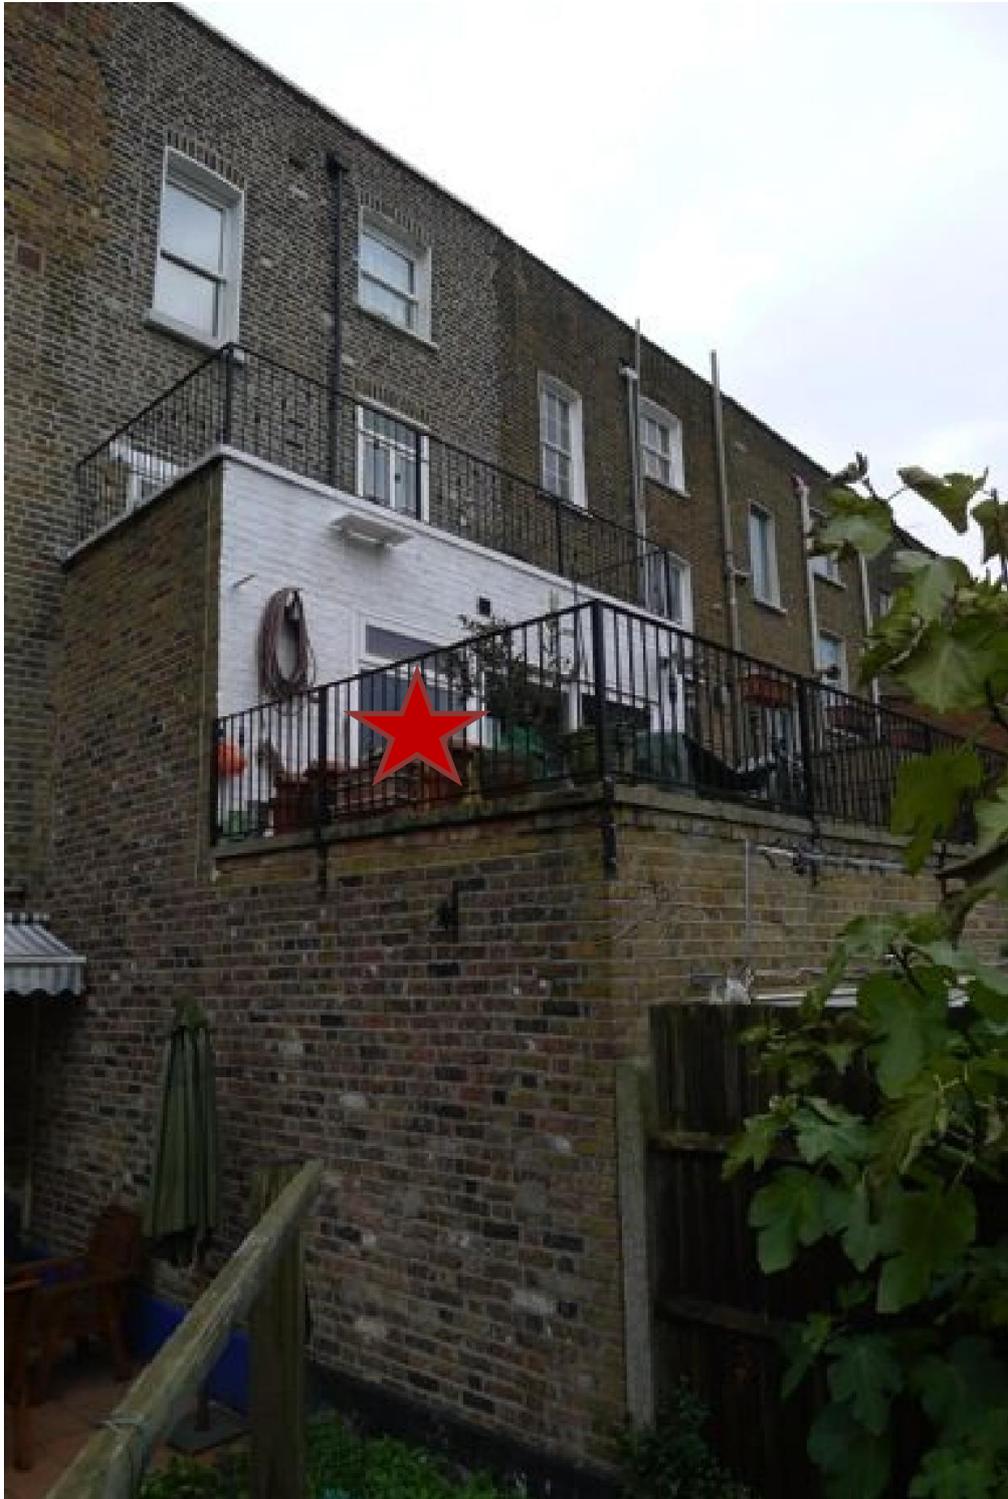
View from 1st floor terrace at 144b Agar Grove towards the rear elevation of the application site
